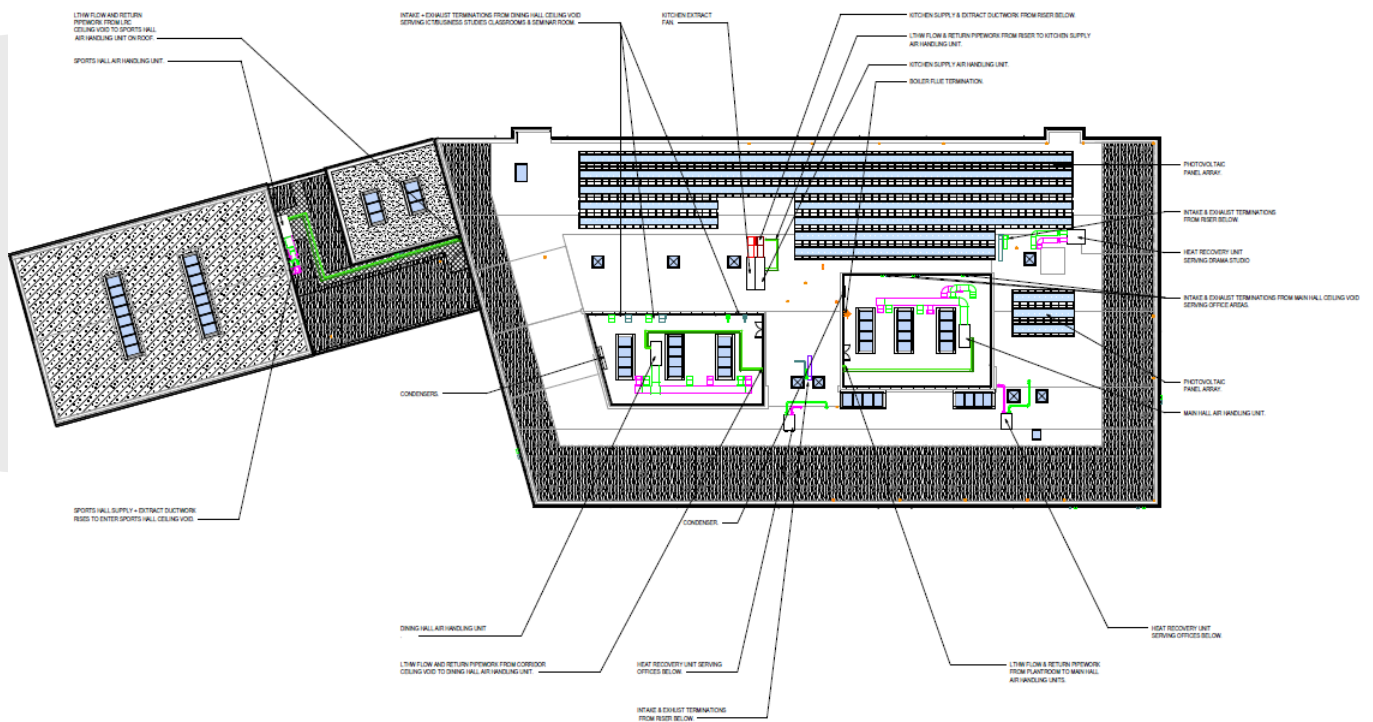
Indicative Roof Layout including Roof Level plant and Photovoltaic Panel Arrays – Turing House School
